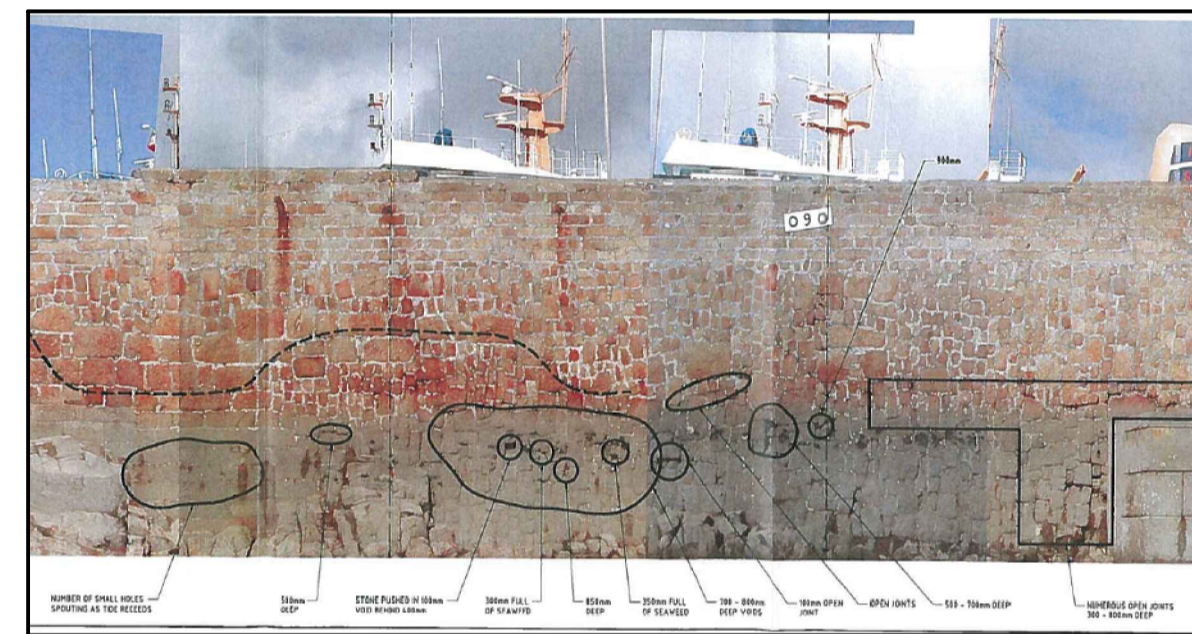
South Pier - Exposed Area to the Left of Concrete Build-out
